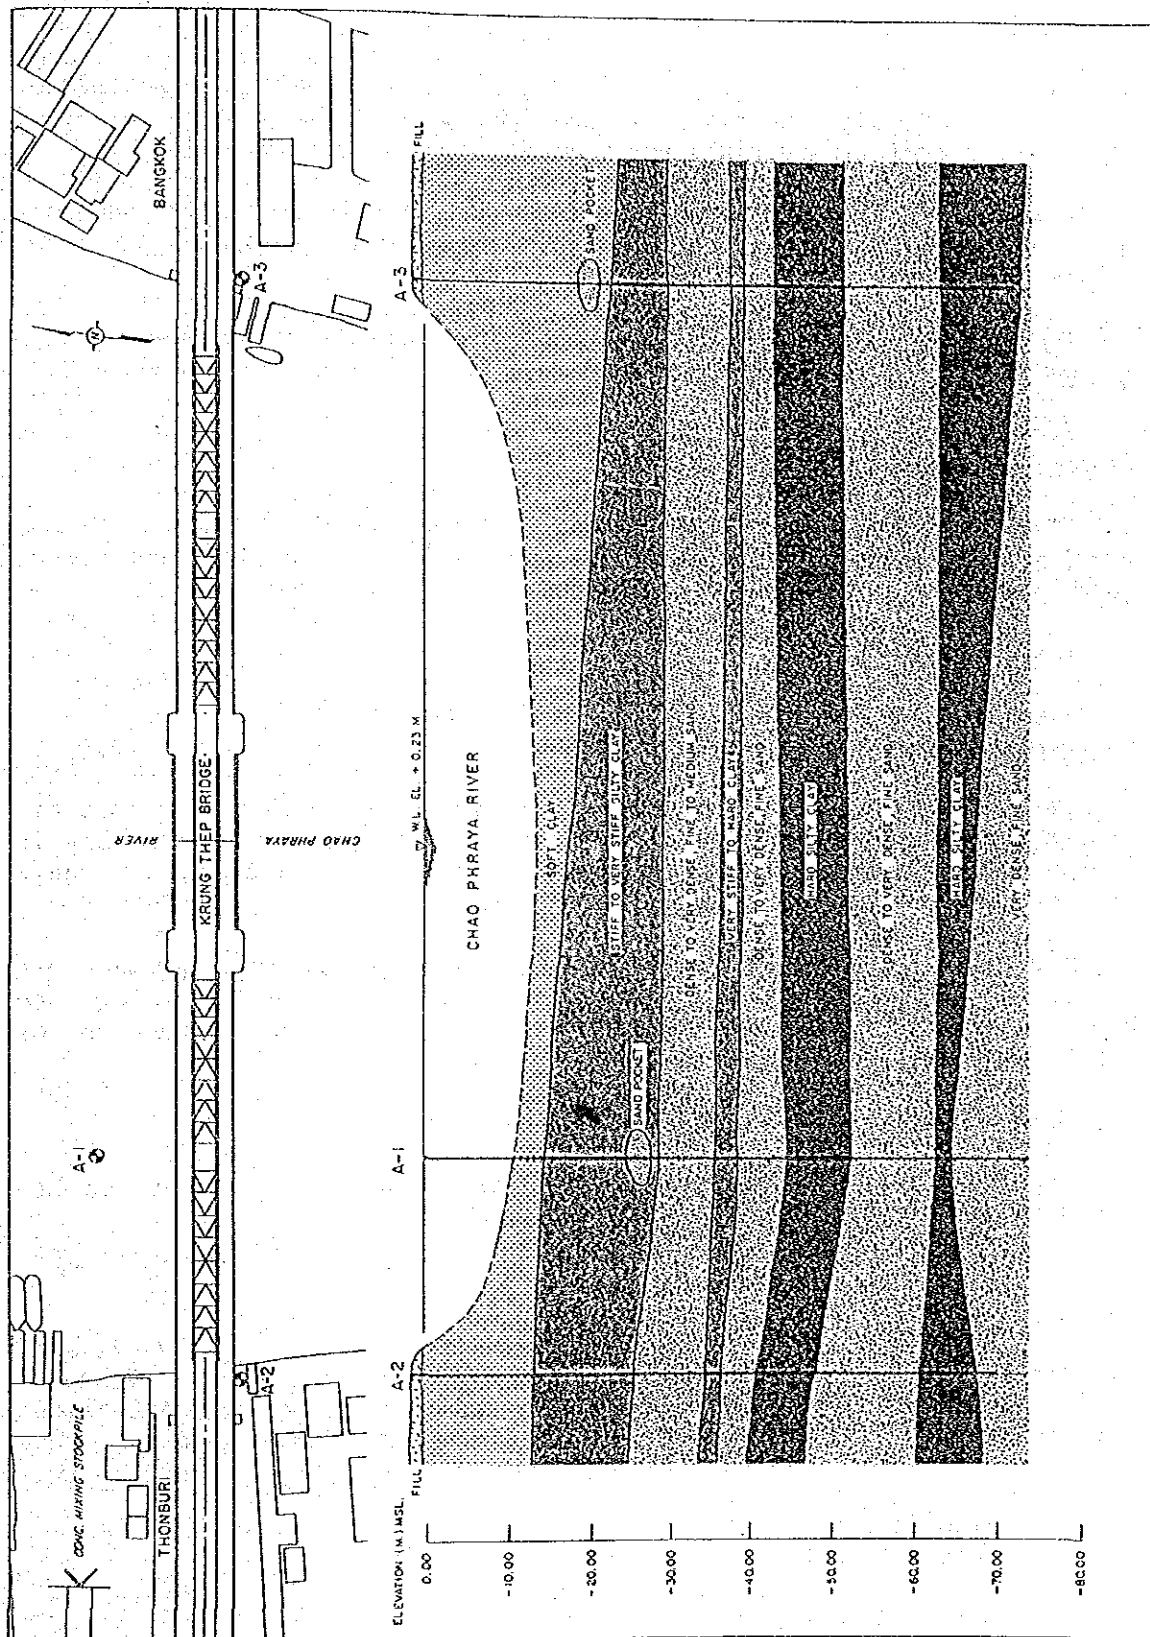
Soil Profile along New Krungthep Bridge Route
